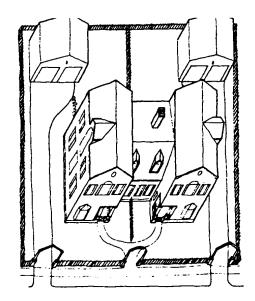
Apartment dwellings may be located on the upper floors of mixed-use buildings above commercial uses.
